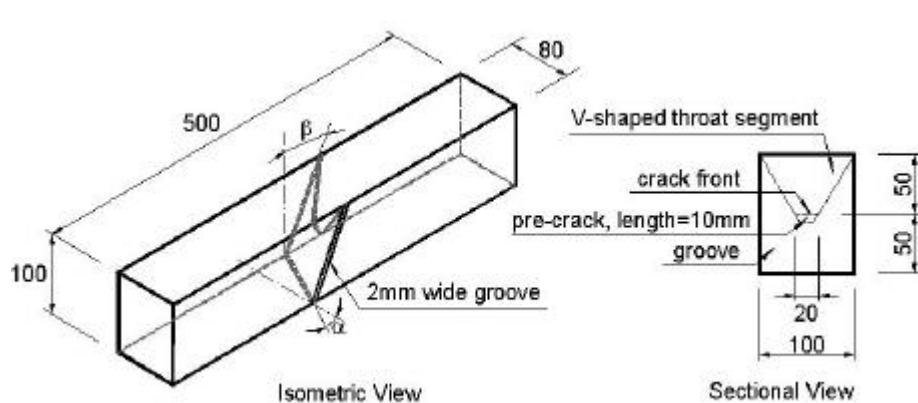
Beam specimen subject to mixed mode I, II and III loading (units in mm)
